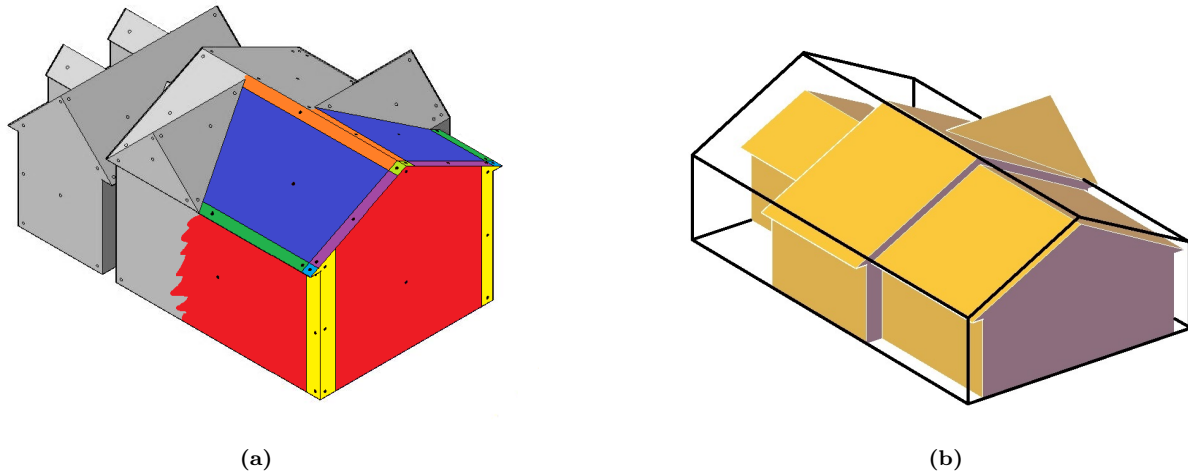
(a) ASCE/SEI 7-16 Components & Cladding zones on House 7 (1-blue, 2e-green, 2n-purple, 2r-orange, 3e-light blue and 3r-light green) (b) envelope House 1 for MWFRS calculation.
